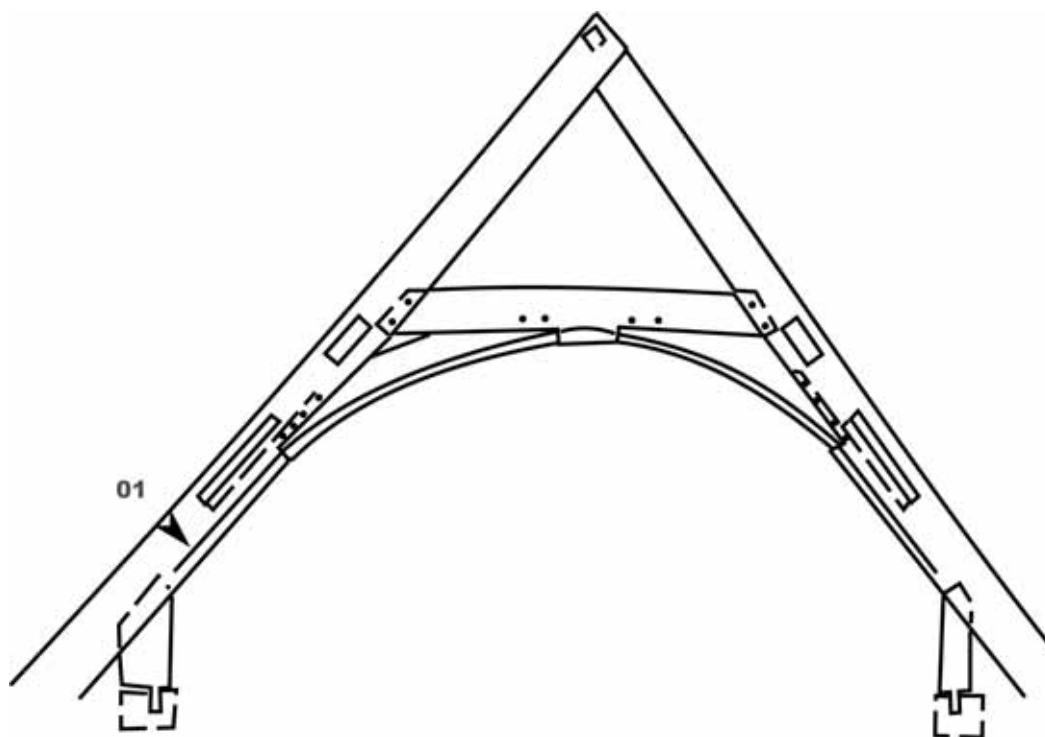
St Mary's Church, truss 2 east face, showing the location of sample SAR-A01
